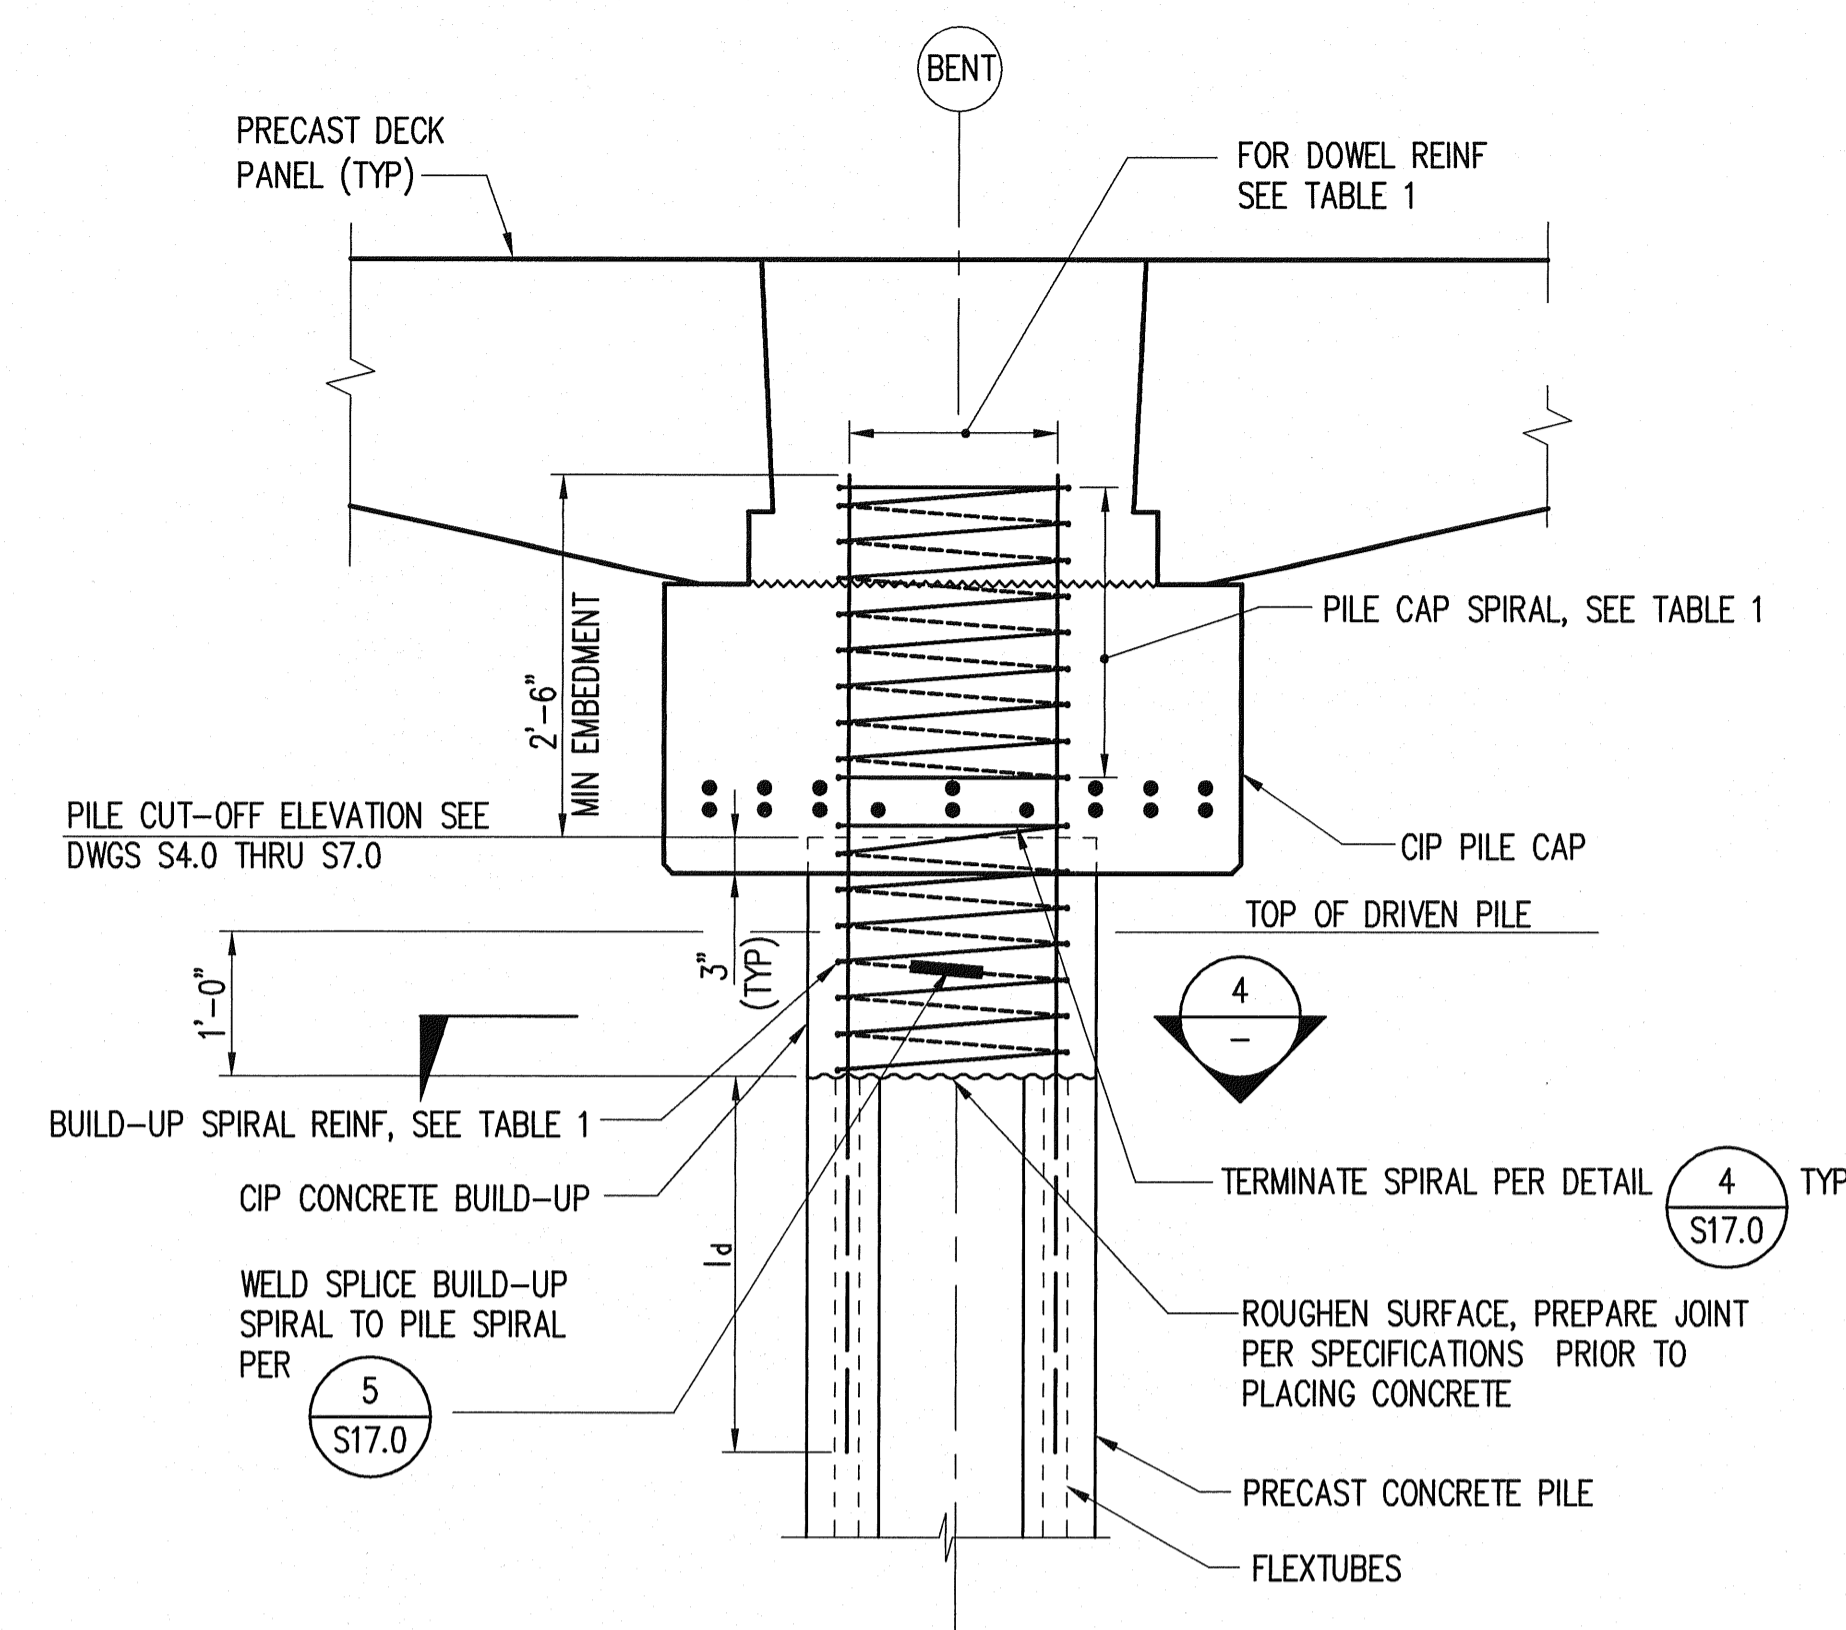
DETAIL - PILE BUILD-UP TYPES 1 & 3
